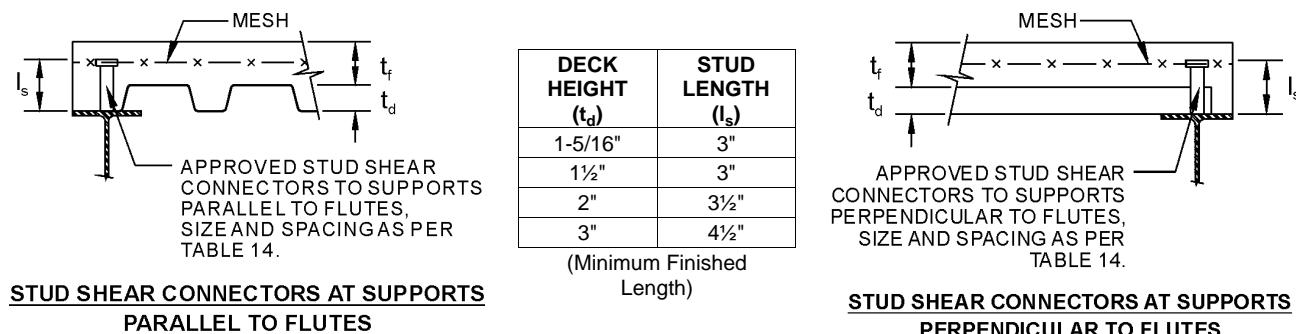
STUD SHEAR CONNECTOR DETAILS
